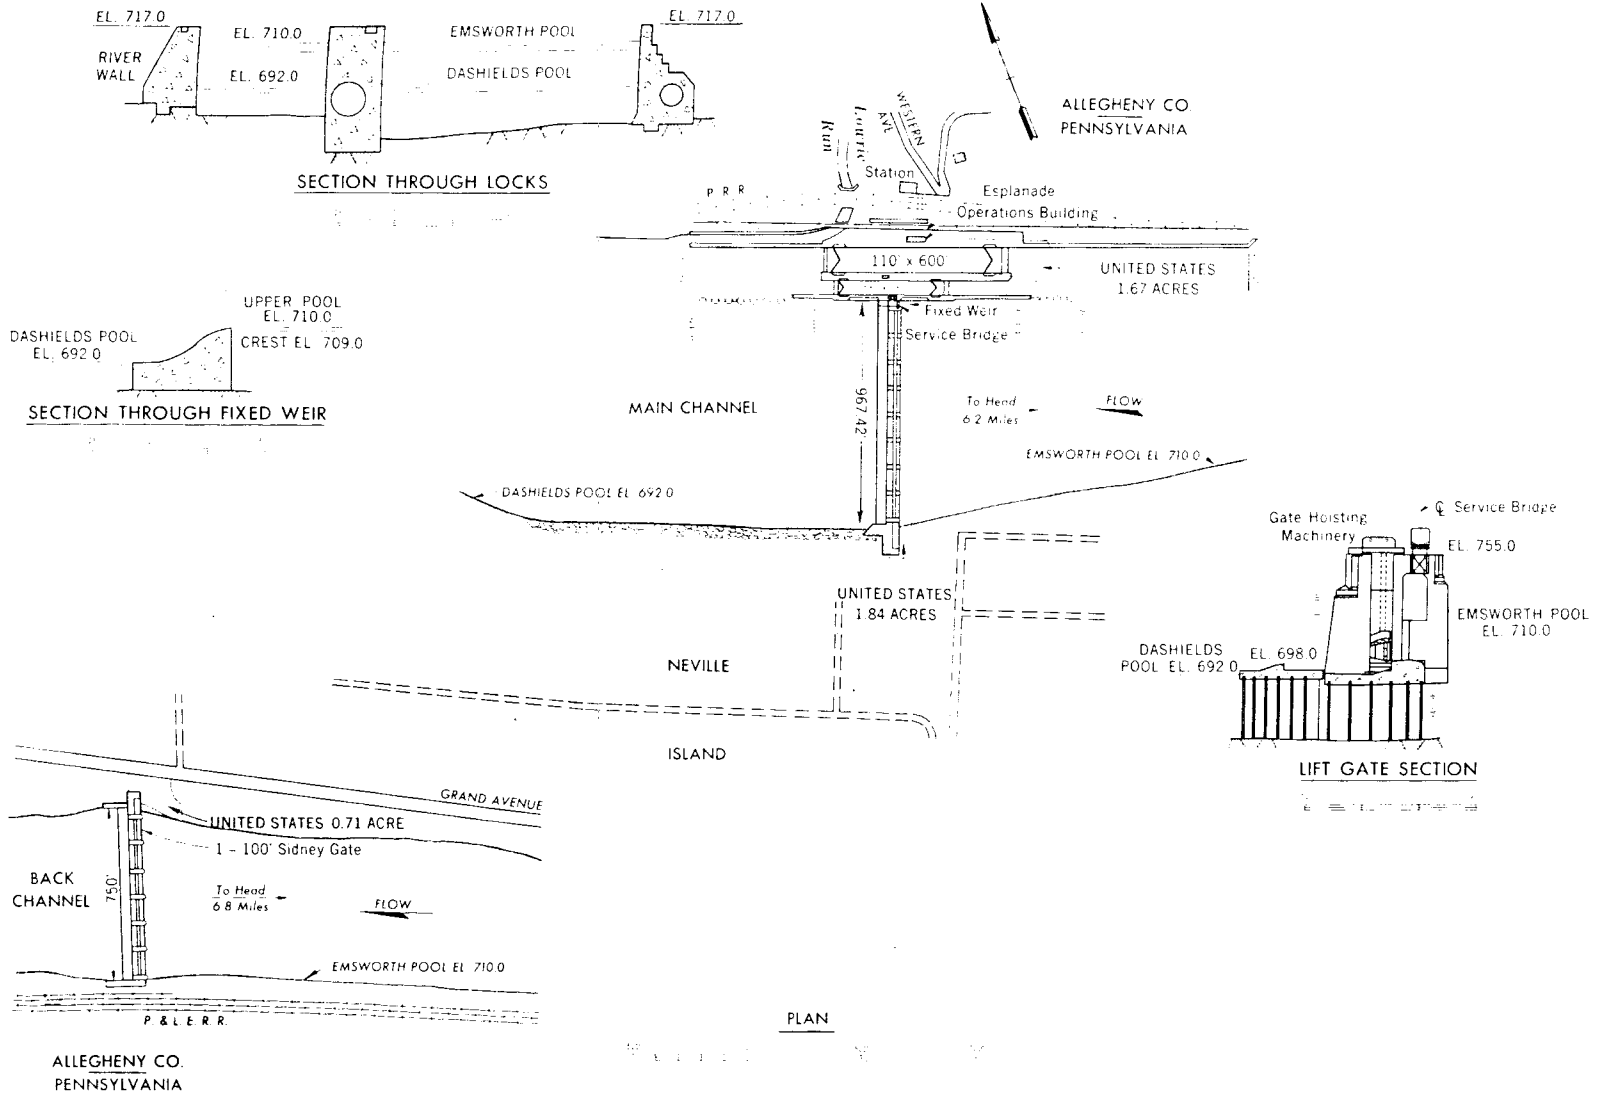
Plan and sections of Emsworth Locks and Dam
